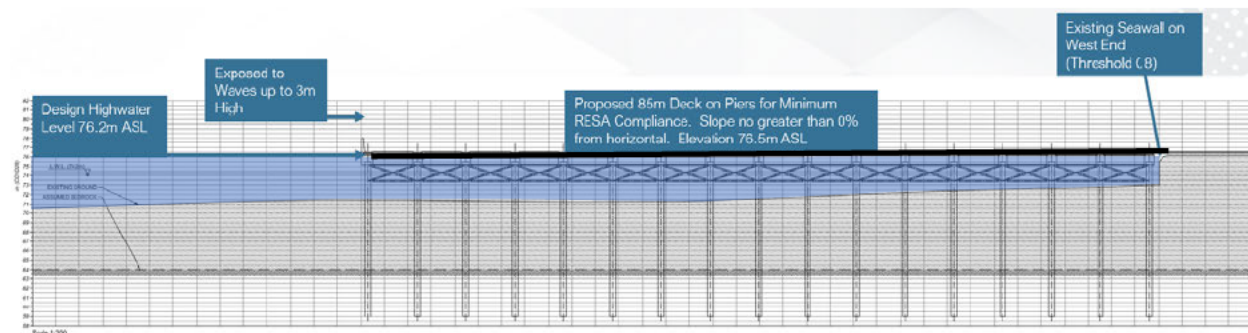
Typical Deck on Piers – Conceptual Design off West End (Lake Ontario)
